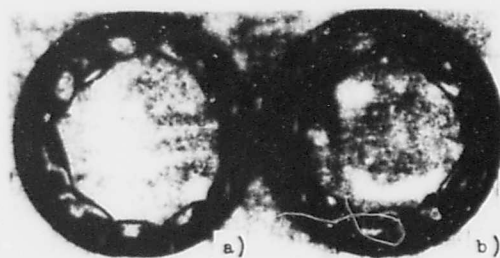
Photographs of test pieces (end view) after buckling.
